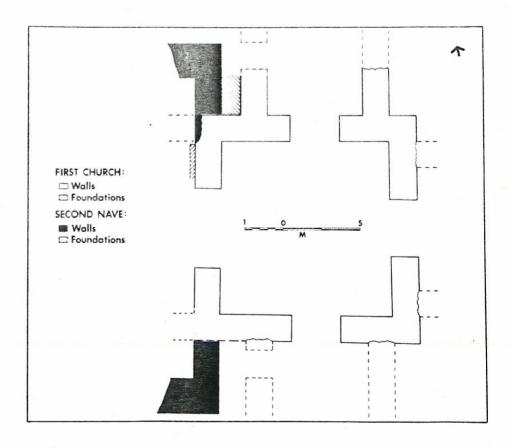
St Peter, Wootton Wawen: plan of the surviving elements of the tower and north porticus, showing scars of contemporary walls, and of the east end of the second nave
